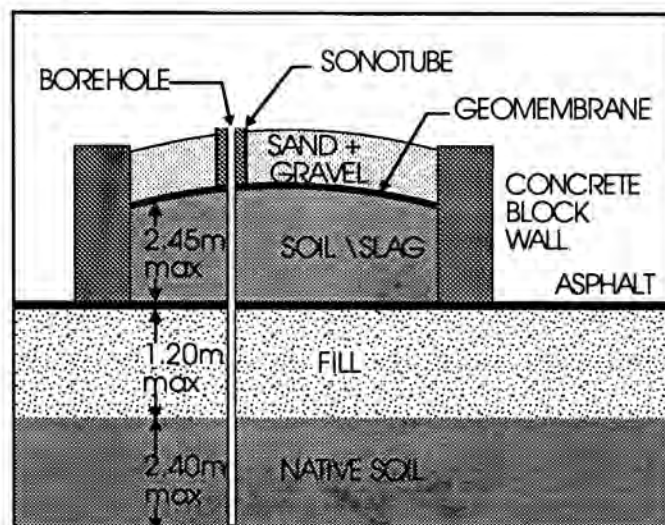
Typical vertical cross-section through the temporary storage facility at the Surrey site, showing the three layers of interest (soil/slag, fill, native soil).
